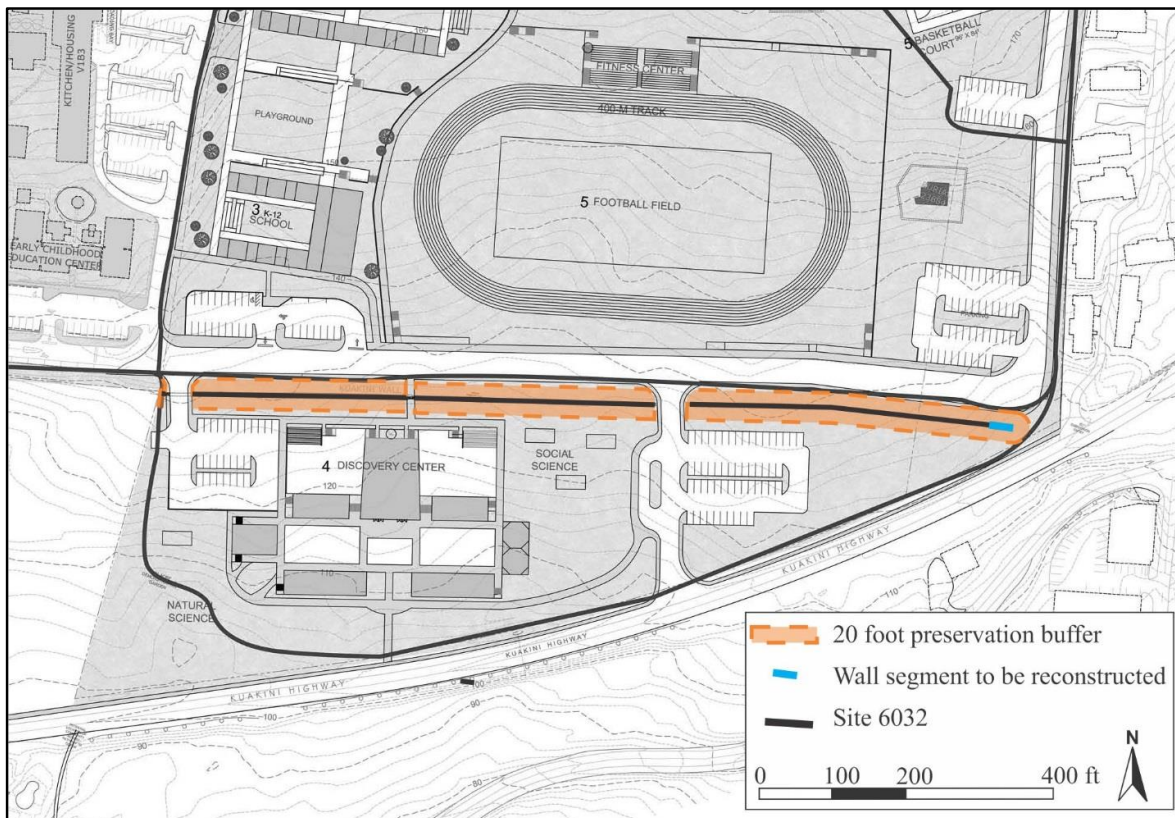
Detail of development plan with Site 6032 and preservation buffer indicated.
